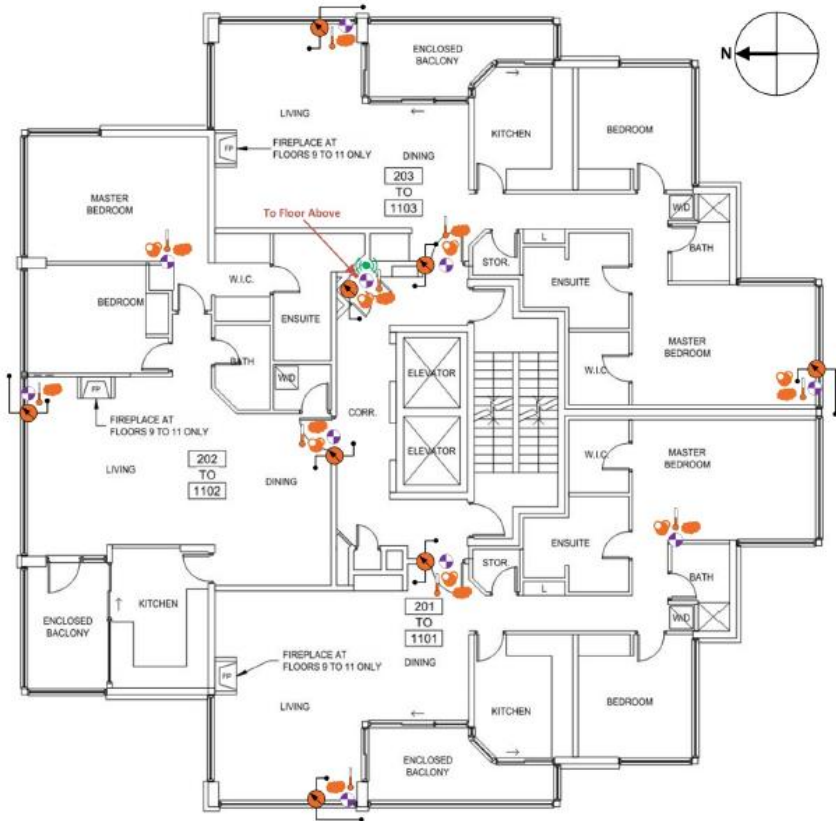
Floor plan showing layout of monitoring equipment for Floors 3 and 11
